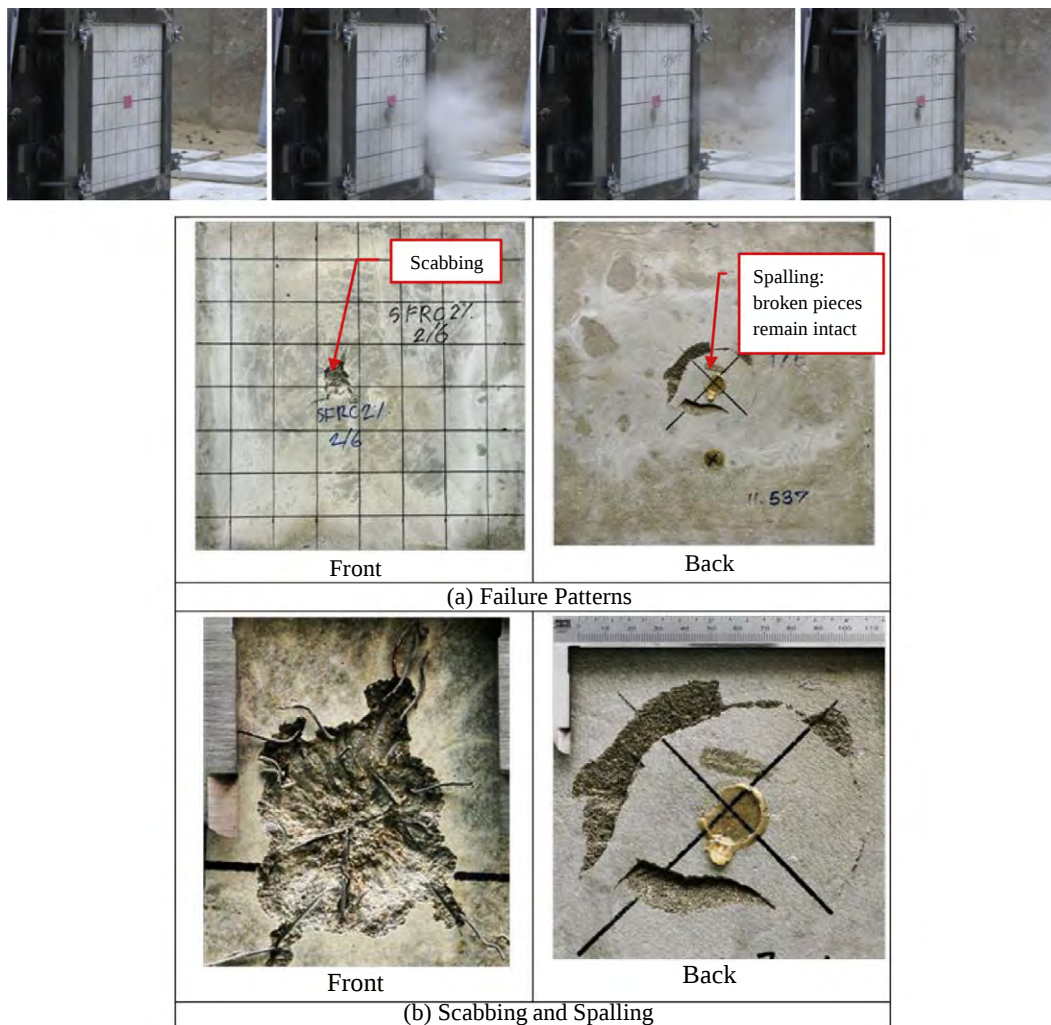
Failure patterns and impact point of single layer SFRC concrete panel. (a) Failure patterns. (b) Scabbing and spalling.
